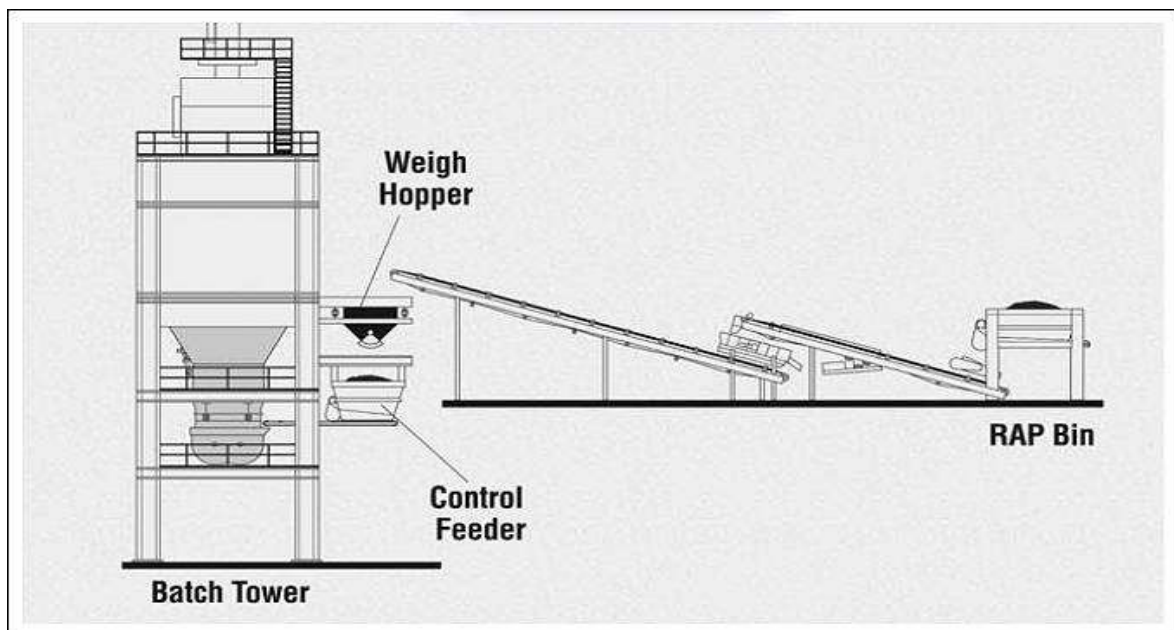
RAP delivery system for batch plants, (Santucci, 2007).
